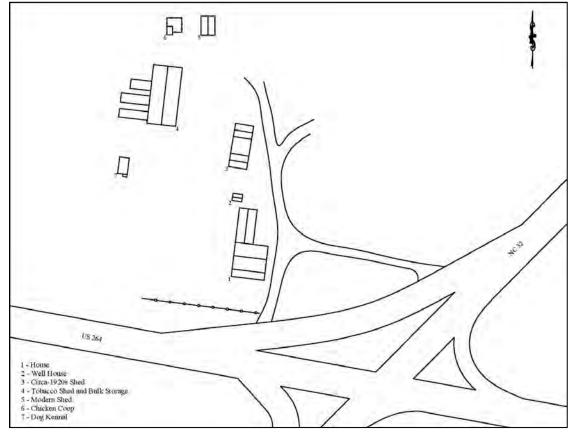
Site plan of the Douglas Farm (BF1400).
